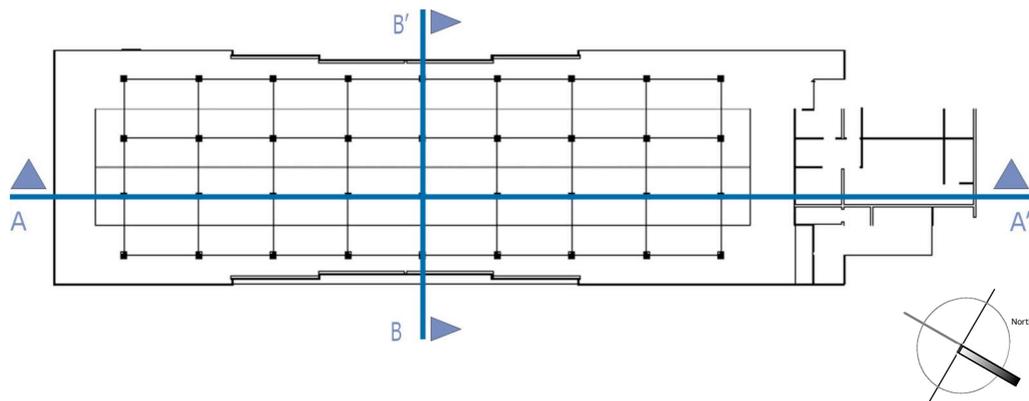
Location of sections A-A' and B-B' over floor plan
